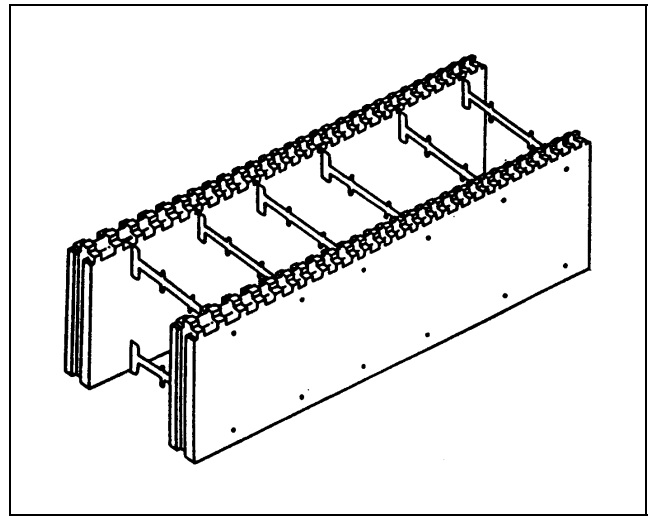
Generic Foam Concrete Form. Steel Webbing or Plastic Ties Are Used to Bridge Unit.
